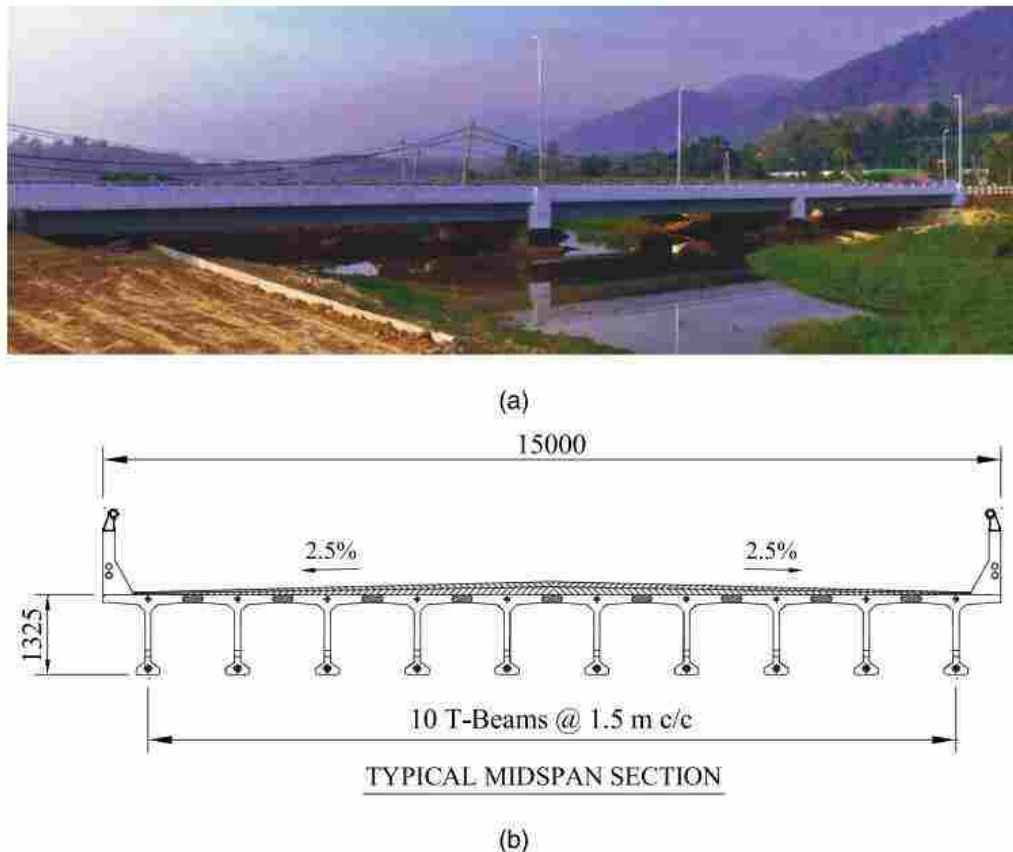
(a) Sungai Nerok bridge (b) Typical Section View (Voo, Foster, & Voo, 2014).
